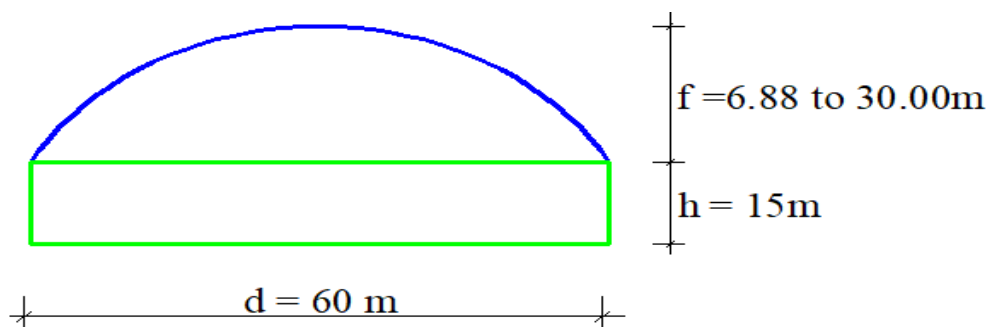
3: Section drawing of the spherical roof shape with dimensions
